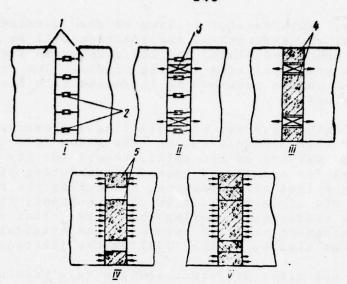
Sequence of work in installing a prestressed junction of reinforced concrete slabs: 1-welding of the reinforcement; I2-installation of jacks and stressing of the welded reinforcement; III-filling of the joints with a concrete mixture (in addition to the places where the jacks were set uo); IV-removal of the jacks (elongated reinforcement tending to become shorter, compresses the concrete in the gap); V-filling the places where the jacks are set up with a concrete mixture; 1-reinforced concrete slabs; 2-welded junctions of the reinforcement of contiguous slabs; 3-jacks; 4-frehly laid concrete; 5-concrete reaching the calculated strength.
